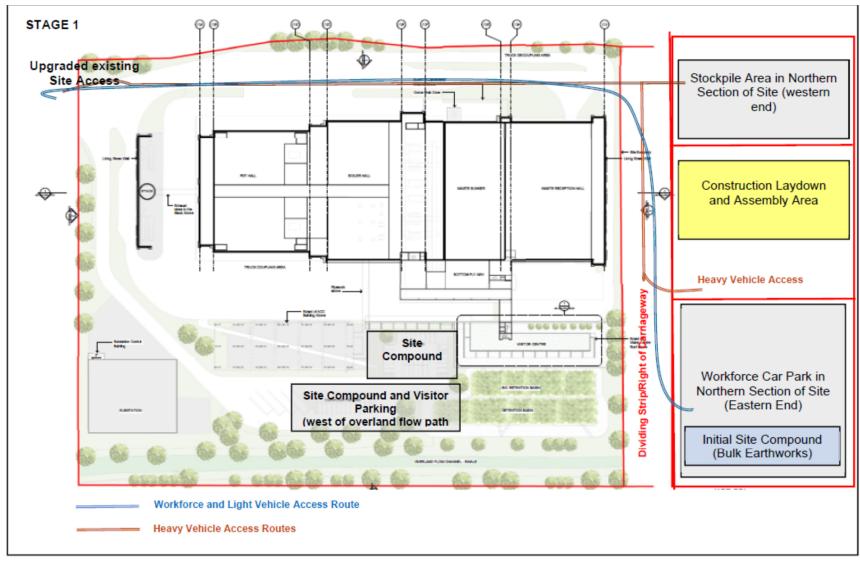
Indicative Site Layout Stage 1 (Enabling Works and Bulk Earthworks)
